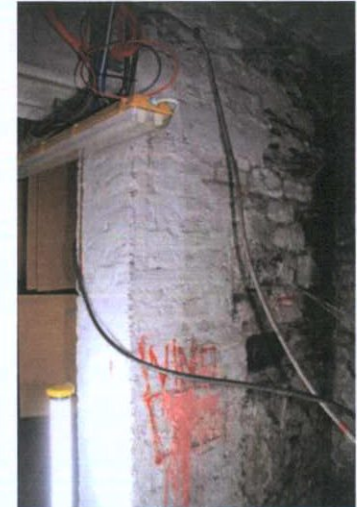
B-2 – View to north-west; mix of brick and Calp limestone
